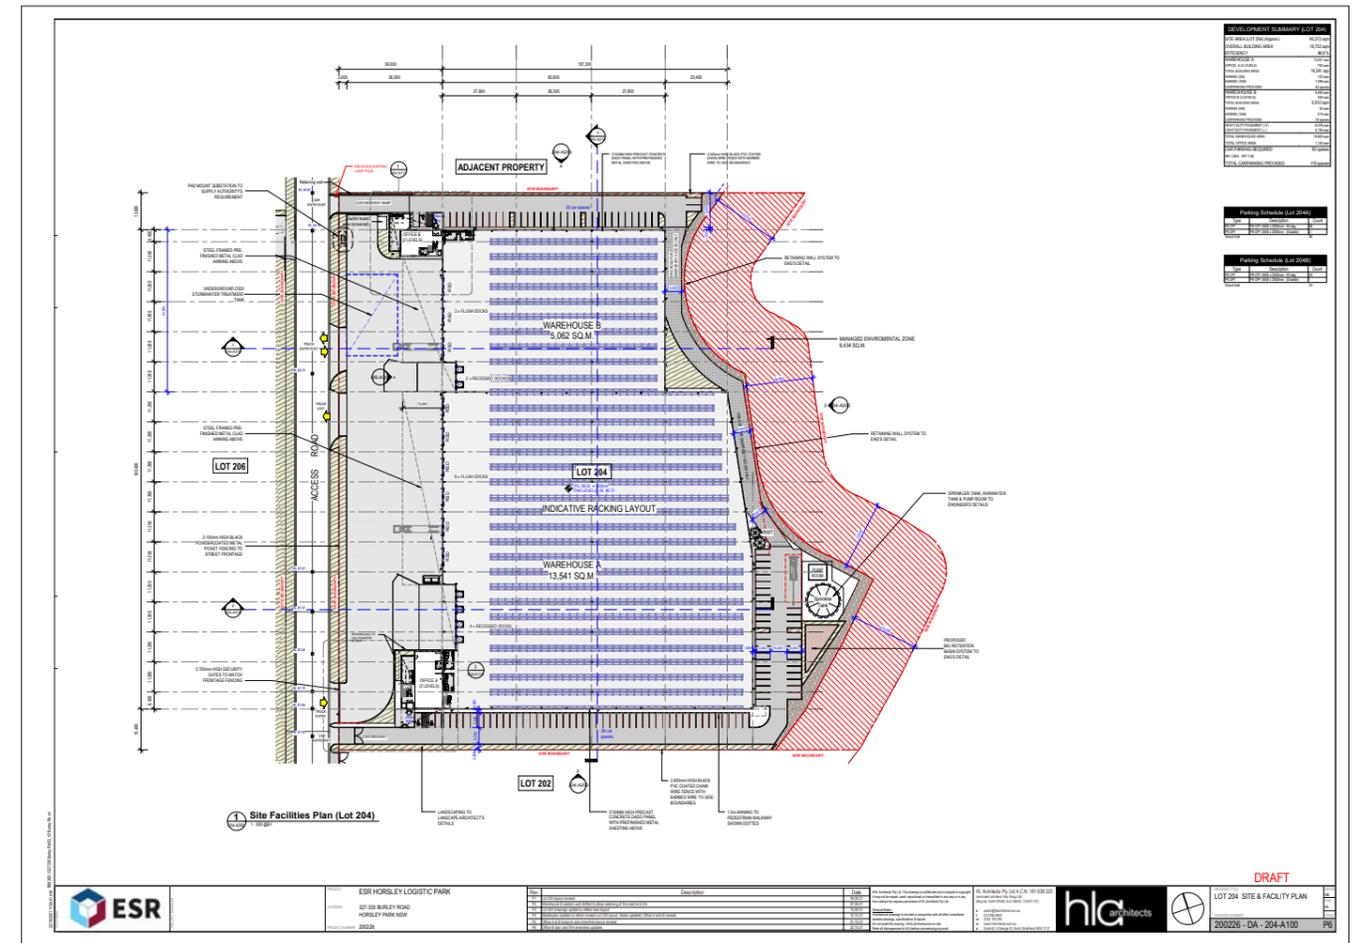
Proposed Modification 4 - Lot 204 Site & Facility Plan (Source: HLA)
